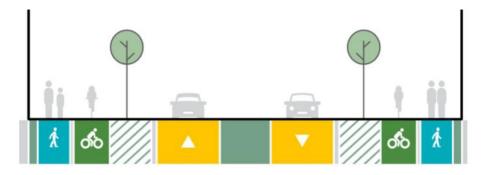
NOR W4 Spedding Road typical cross section - corridor and bridge
